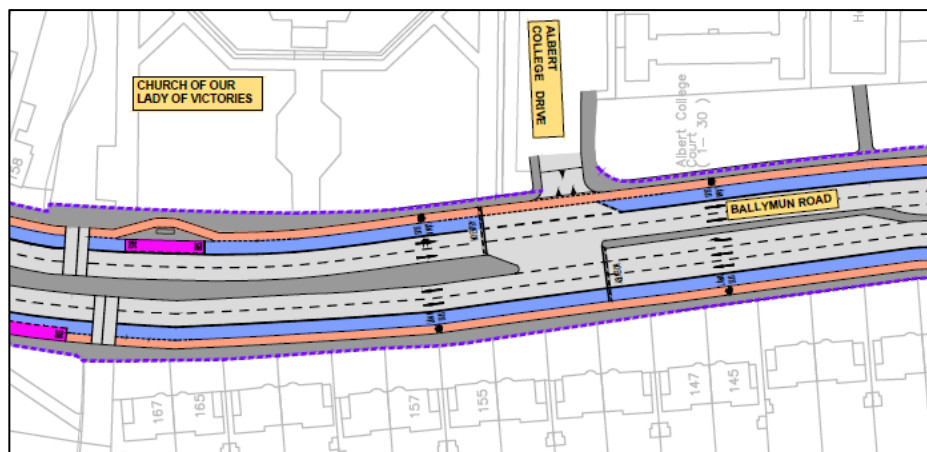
EPR (Option A) Plan layout on Ballymun Road
